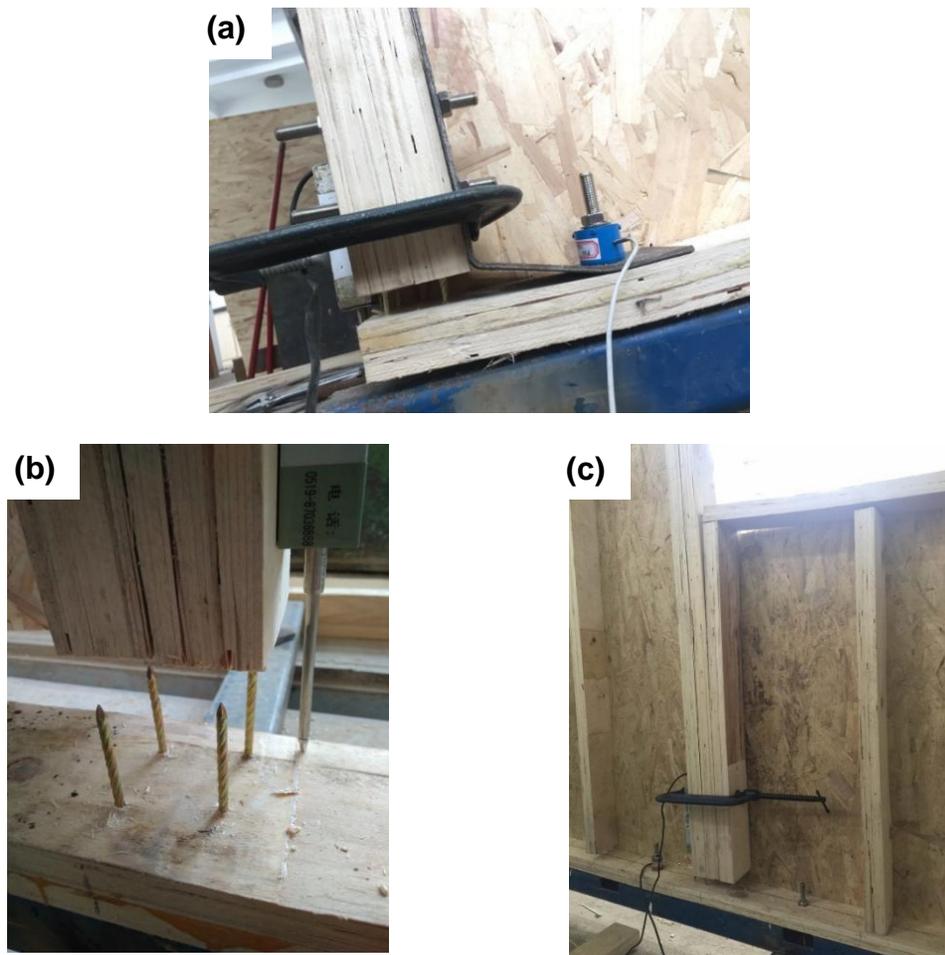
Separation between the studs and the base plate (a) Wall-A; (b) Wall-B; (c) Wall-C
